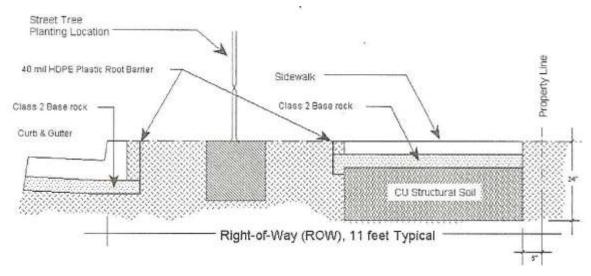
Tree planting diagram for parkway sidewalk construction.
